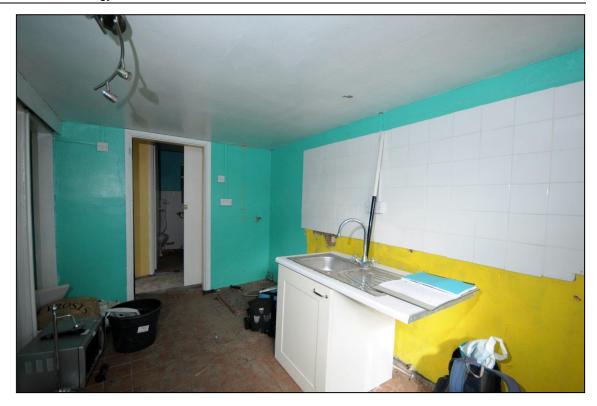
No. 43, kitchen, looking north-west (Scale 1m)
